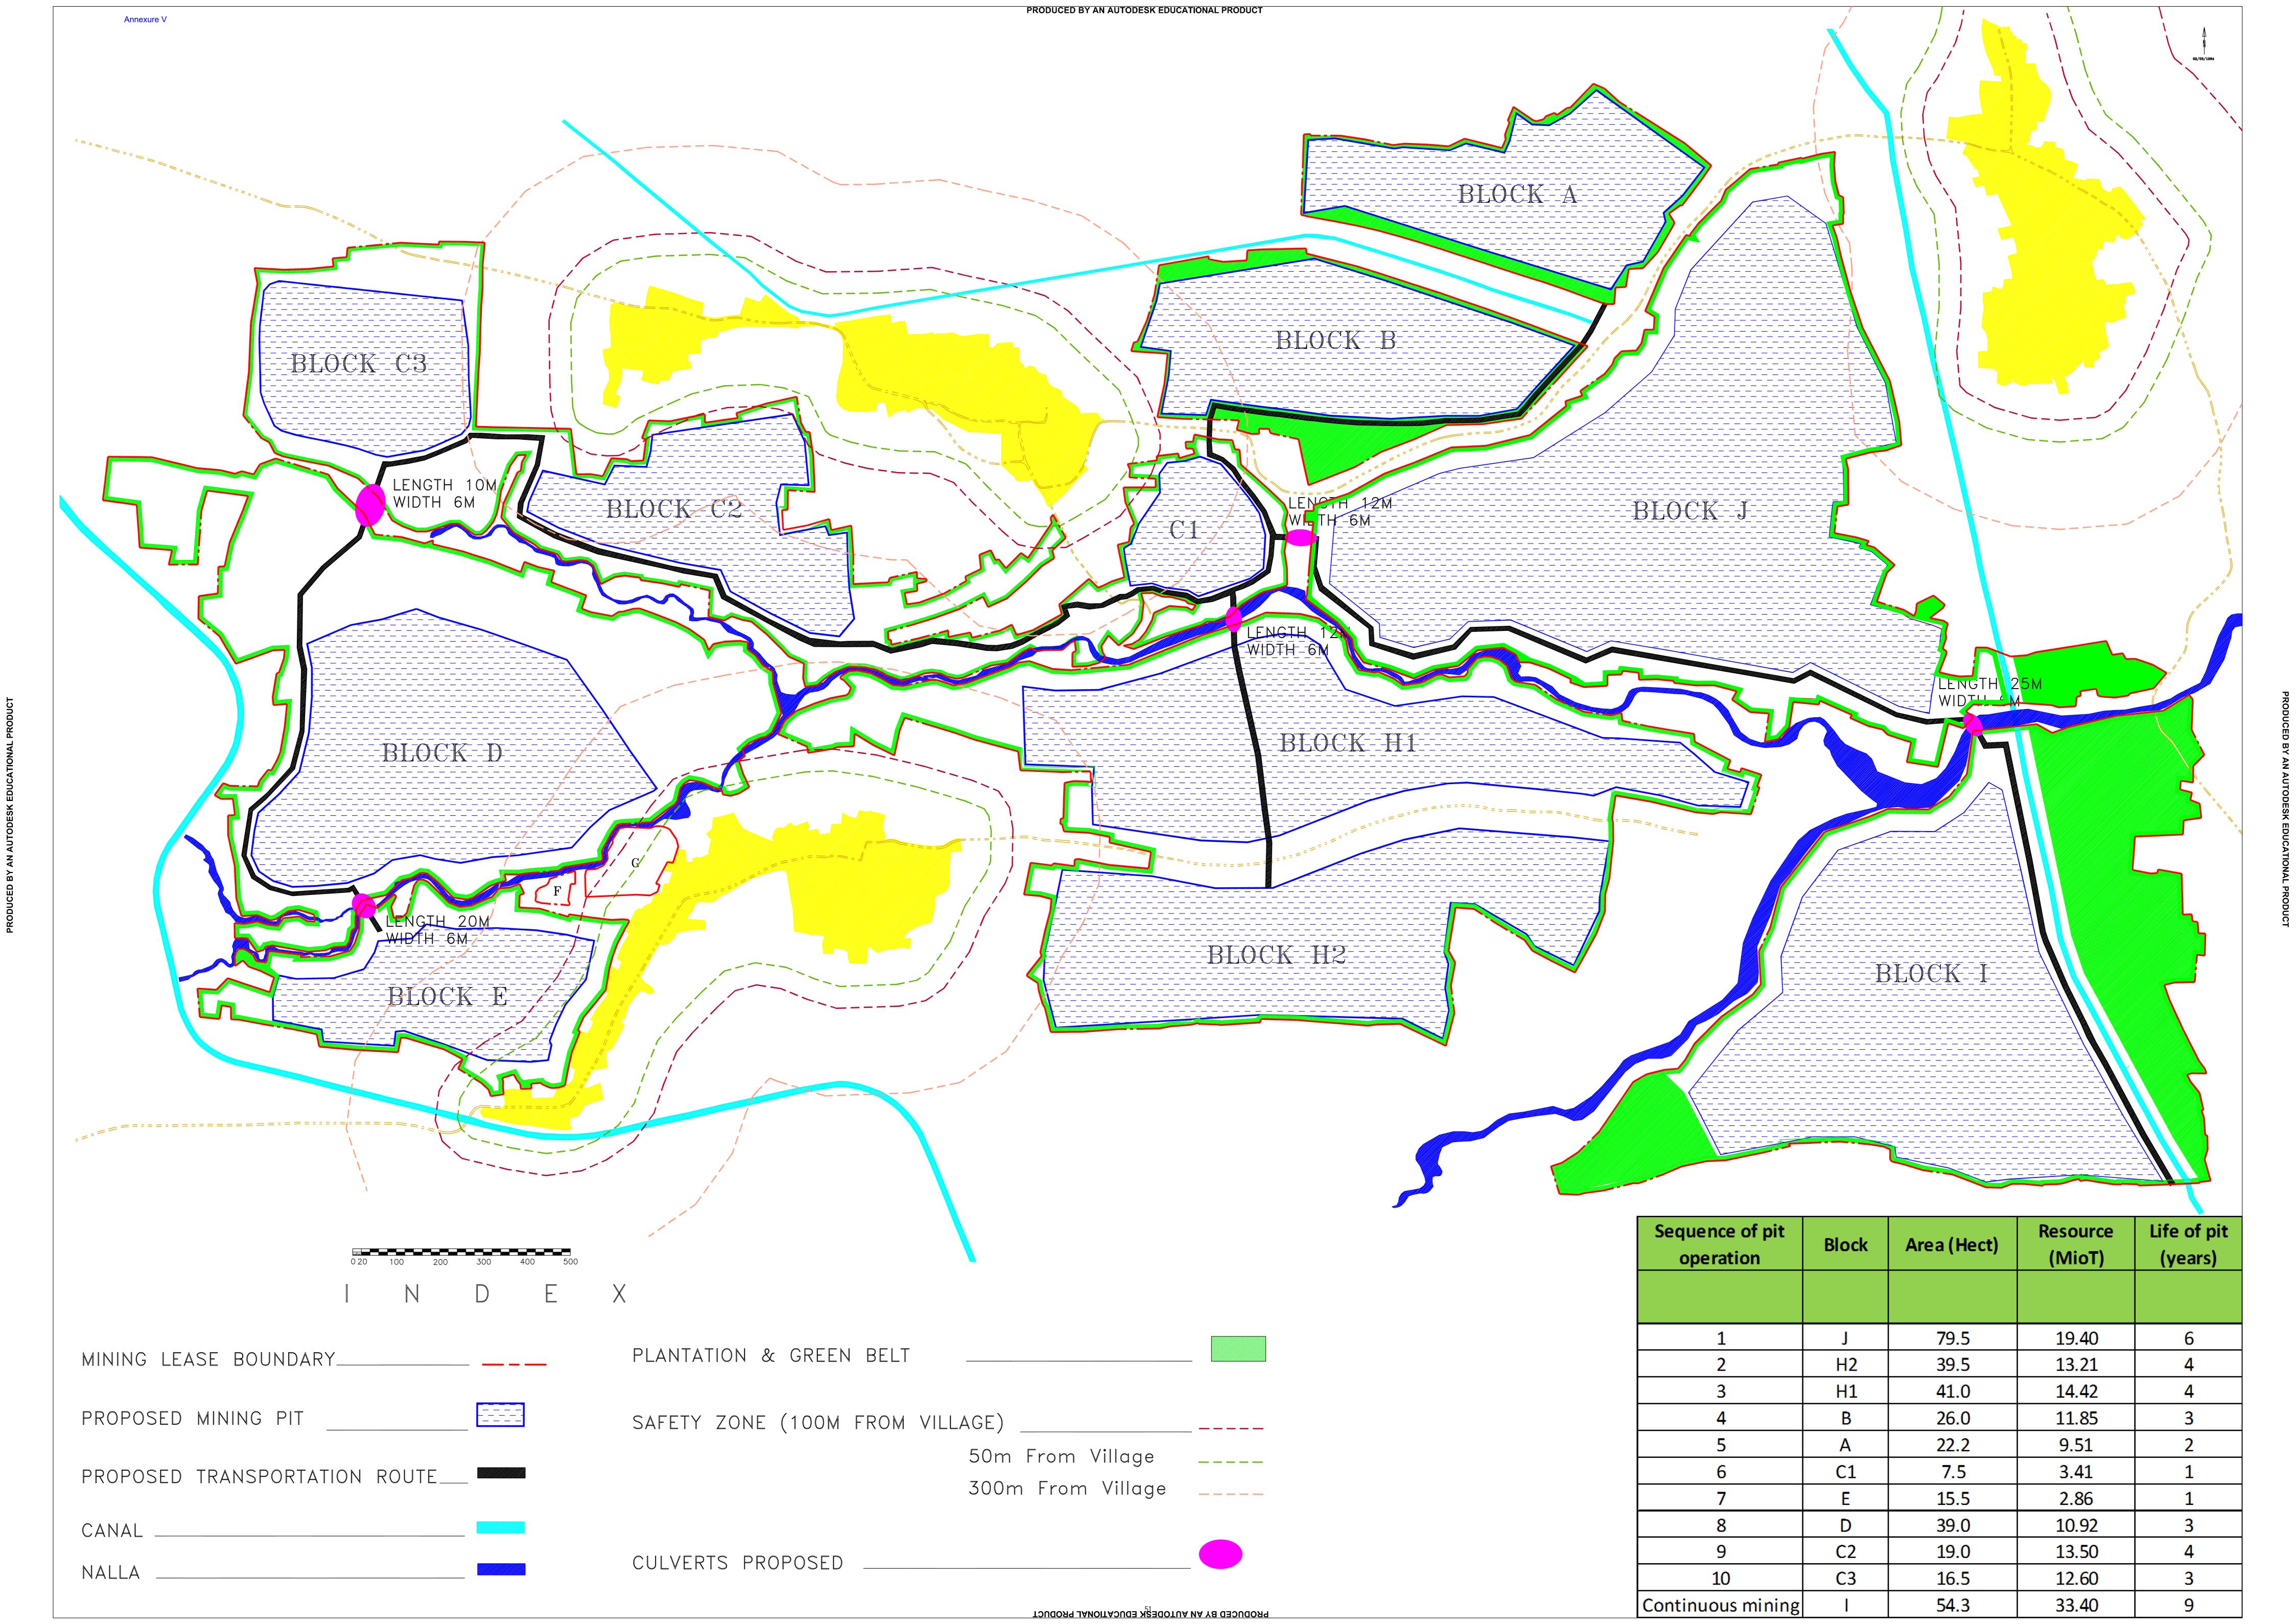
Safety Barrier and Protection Plan to Avoid Horizontal Seepage from Kurang Canal
